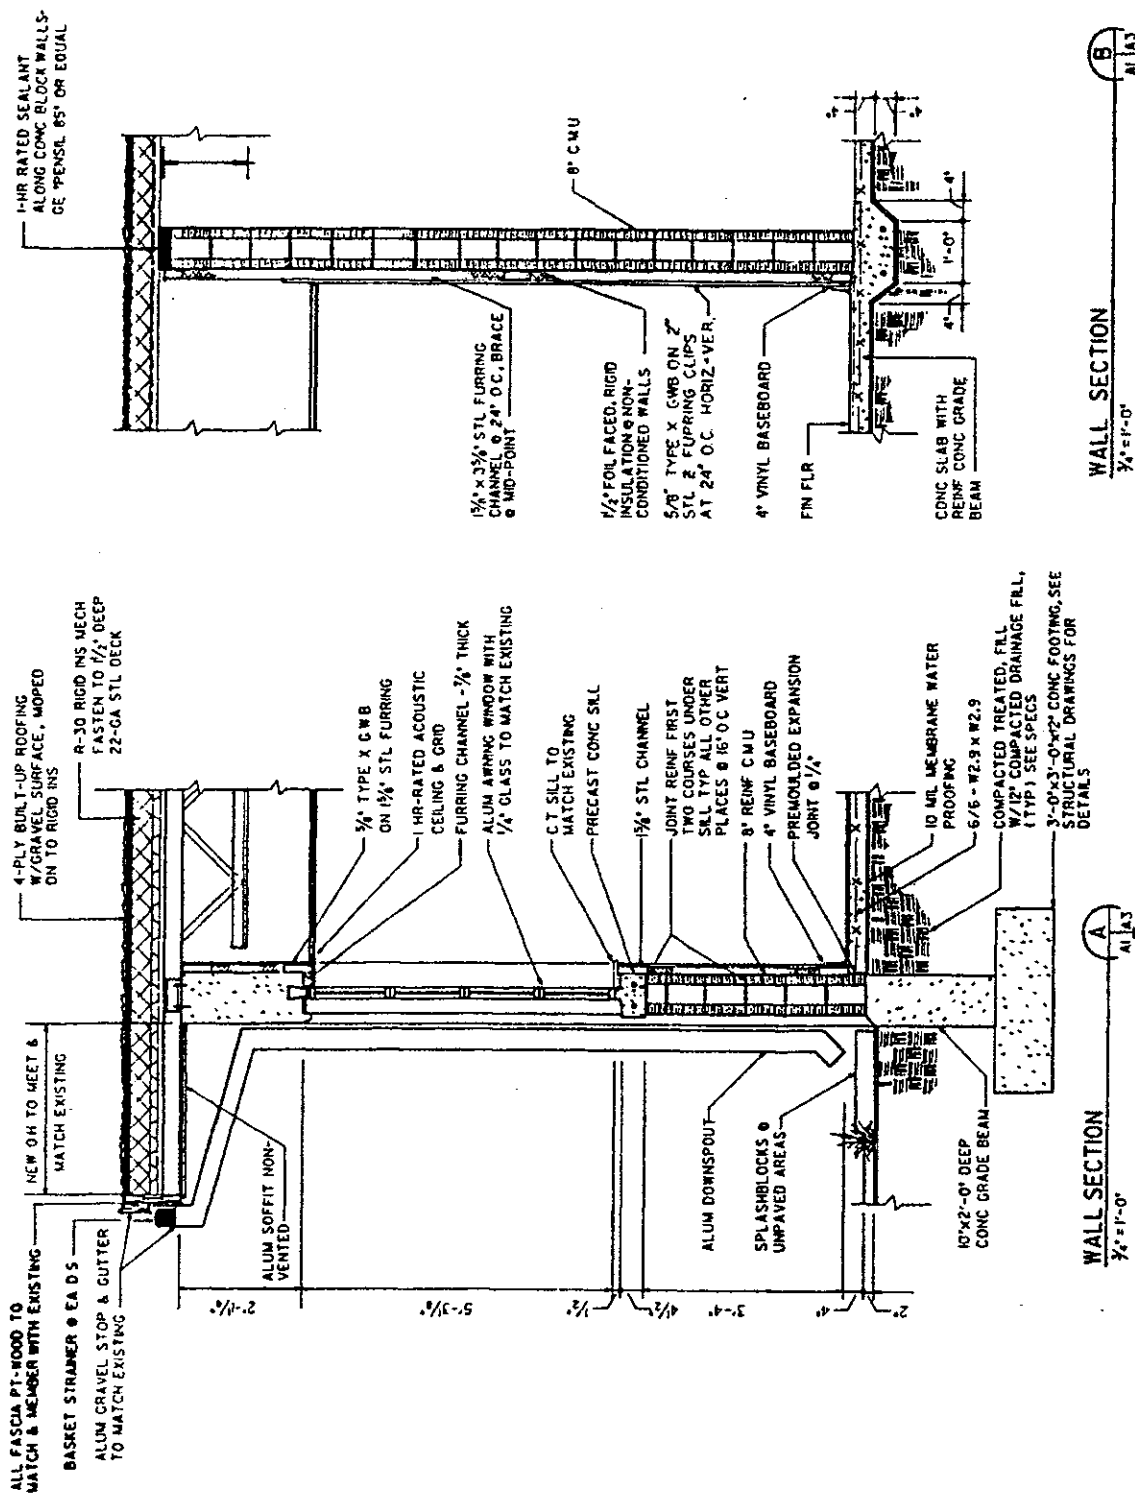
Miscellaneous Wall Sections (Sheet 1 of 2)
